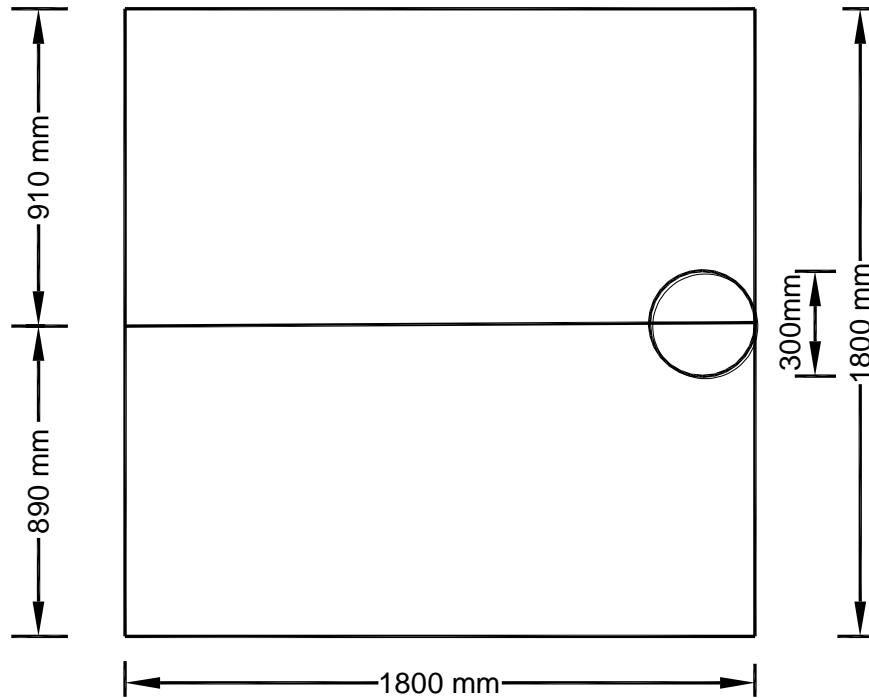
Position of Failure Line when 160 mm Thick HSHPC Pavement Failed at Edge Position
